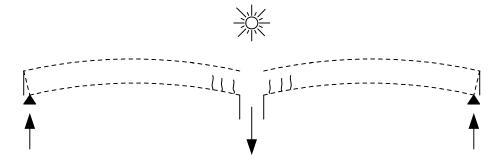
(b) External Restraint Induced Cracks (due to temperature increase in top surface of beam)
